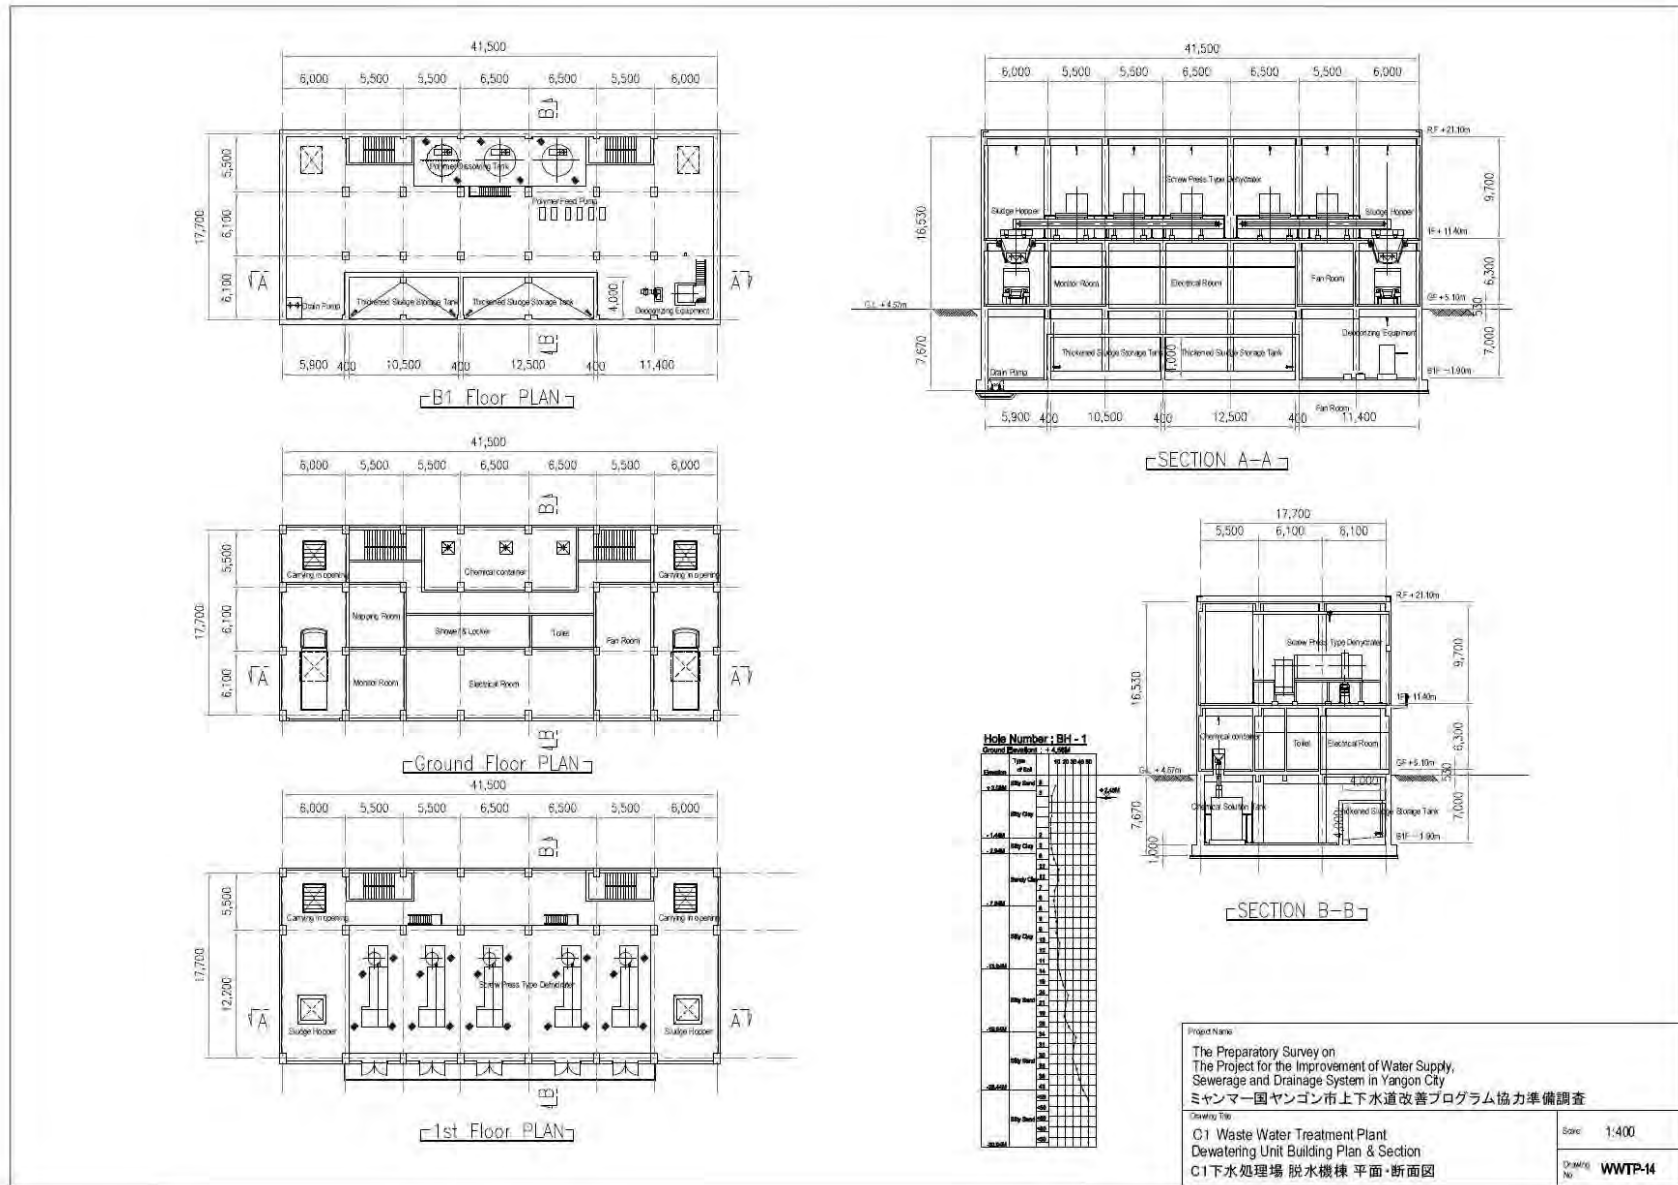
Sludge Dewatering Unit Building, Plan & Section
